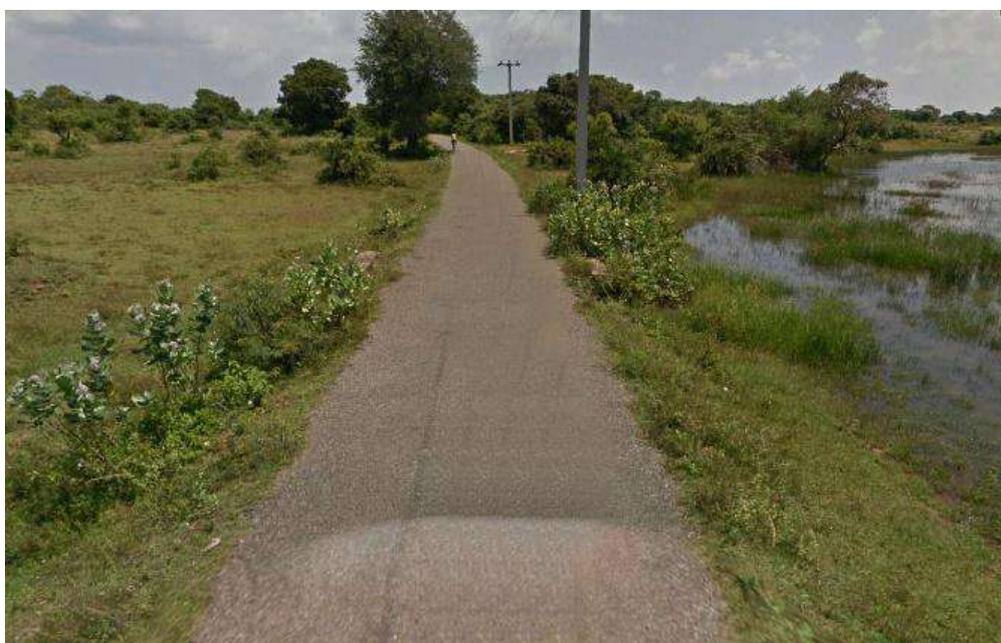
Existing access ways to Sangamankanda Point (Manalchenai road)
